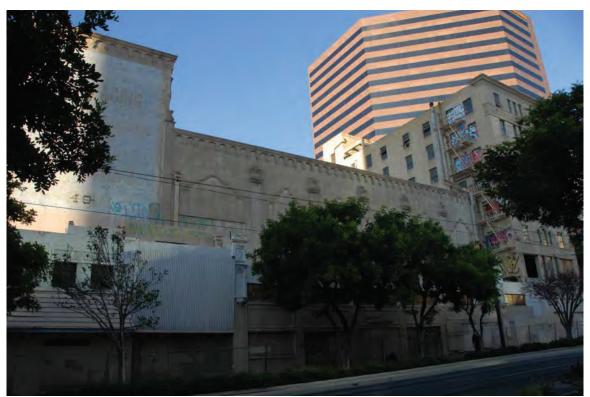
C Street façade, boarded retail storefronts, view facing north.
